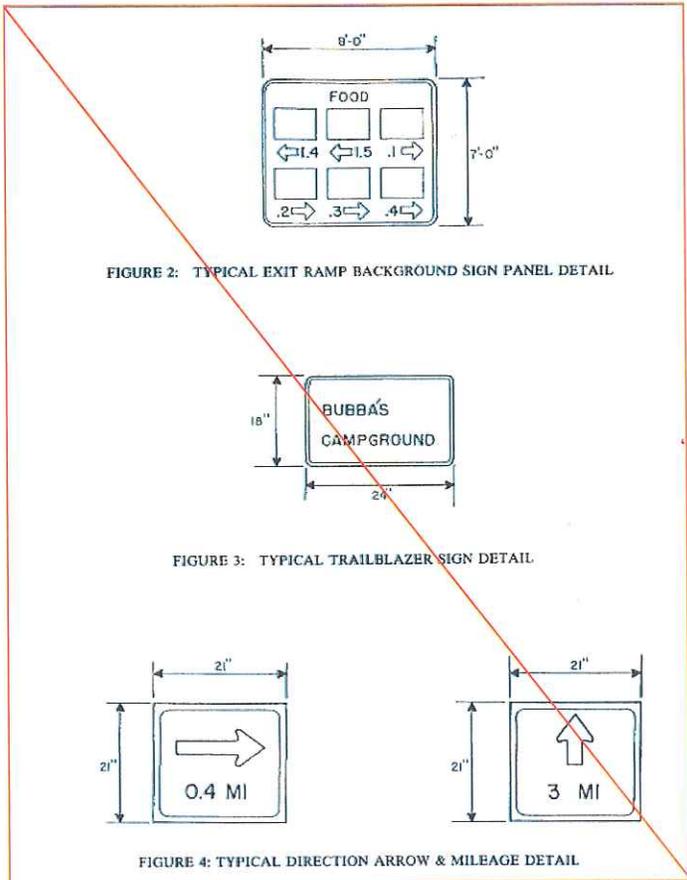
TYPICAL EXIT RAMP BACKGROUND SIGN PANEL DETAIL
